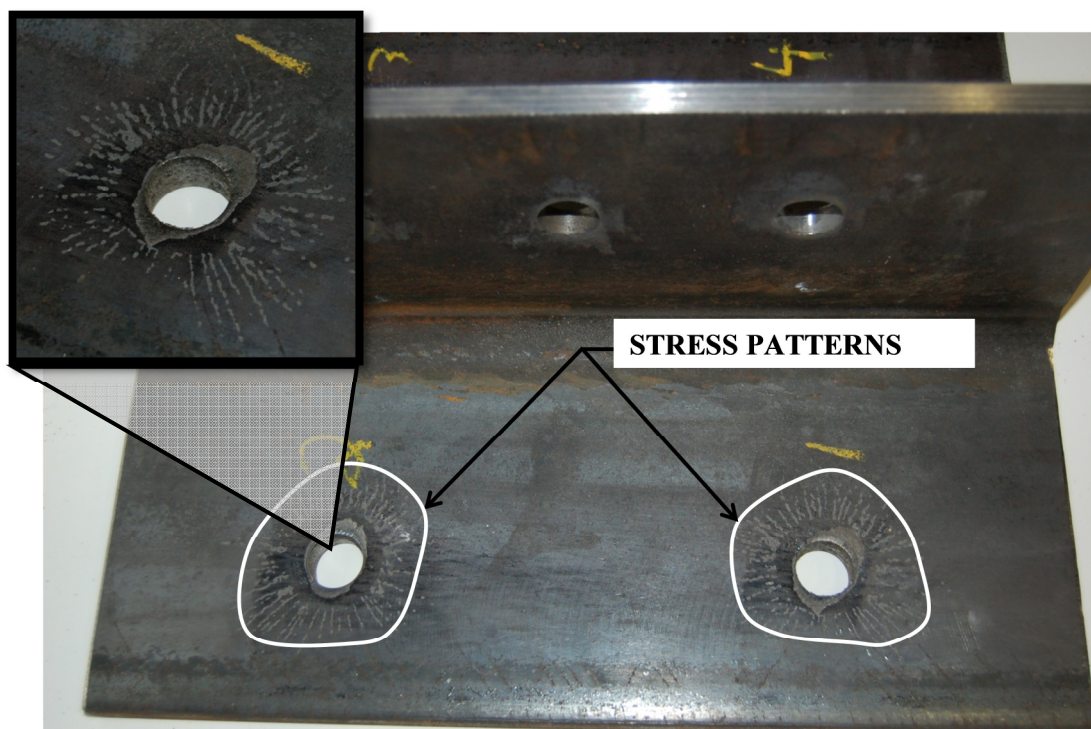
Stress Patterns for Specimen 2.0b.
